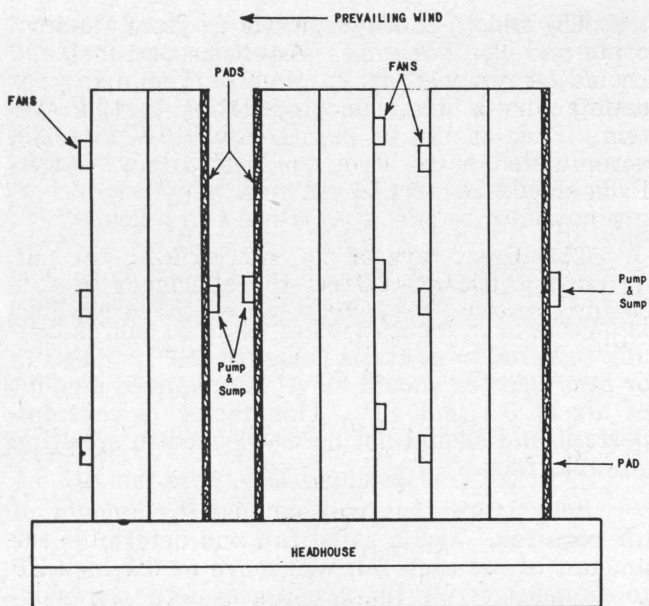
Installation showing pads and fans located in sidewalls of parallel houses.
